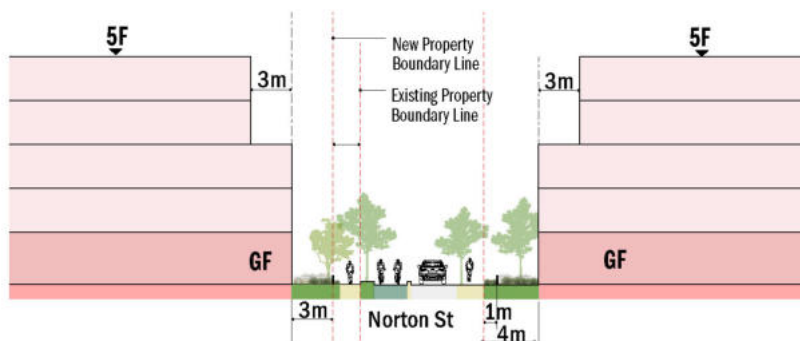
Ashfield East – Norton Street between Queen and Victoria Streets Section
